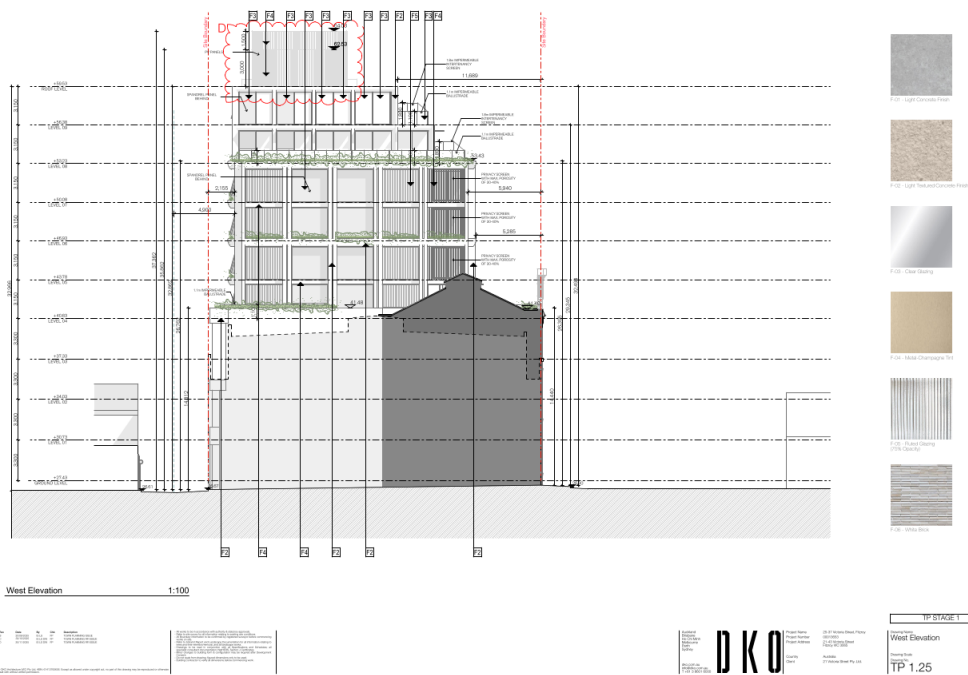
Proposed side elevation showing extent of retained heritage - 25-37 Victoria Street
